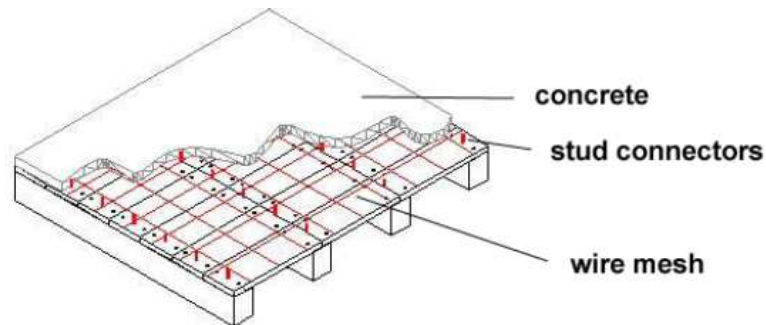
Concrete Topping Overlay above the Existing Floor
